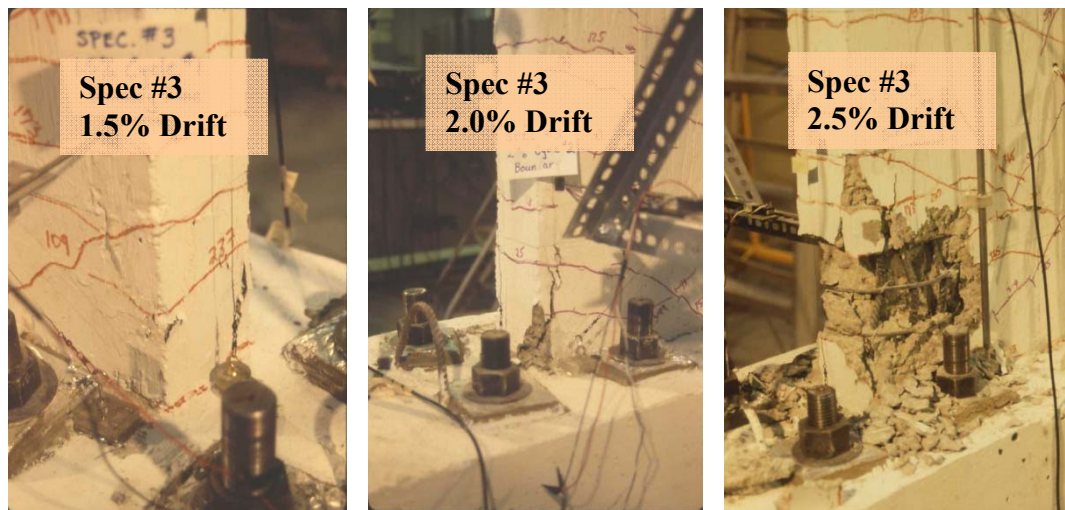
Behavior of a rectangular wall section subjected to constant axial load and reverse cyclic loading.
